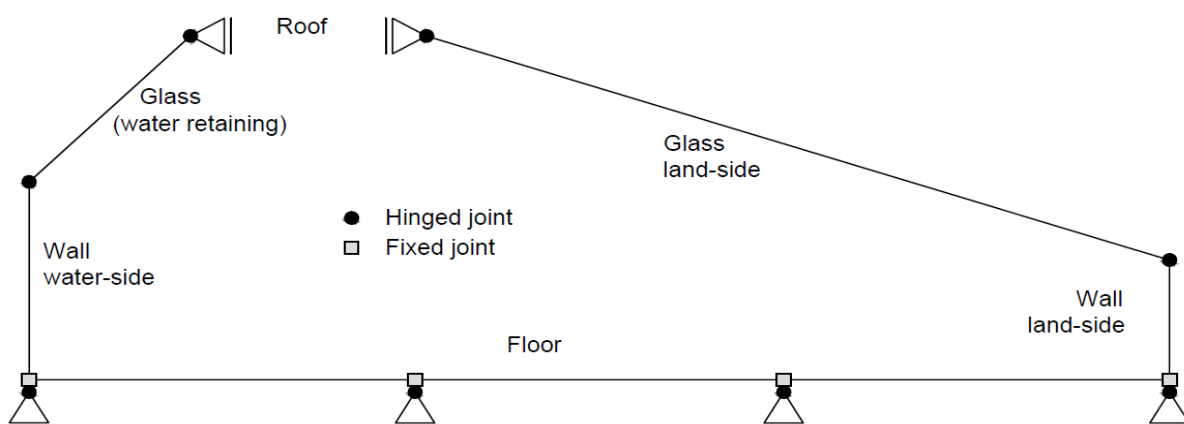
Schematization of structural elements in a cross-section of the glass dike
